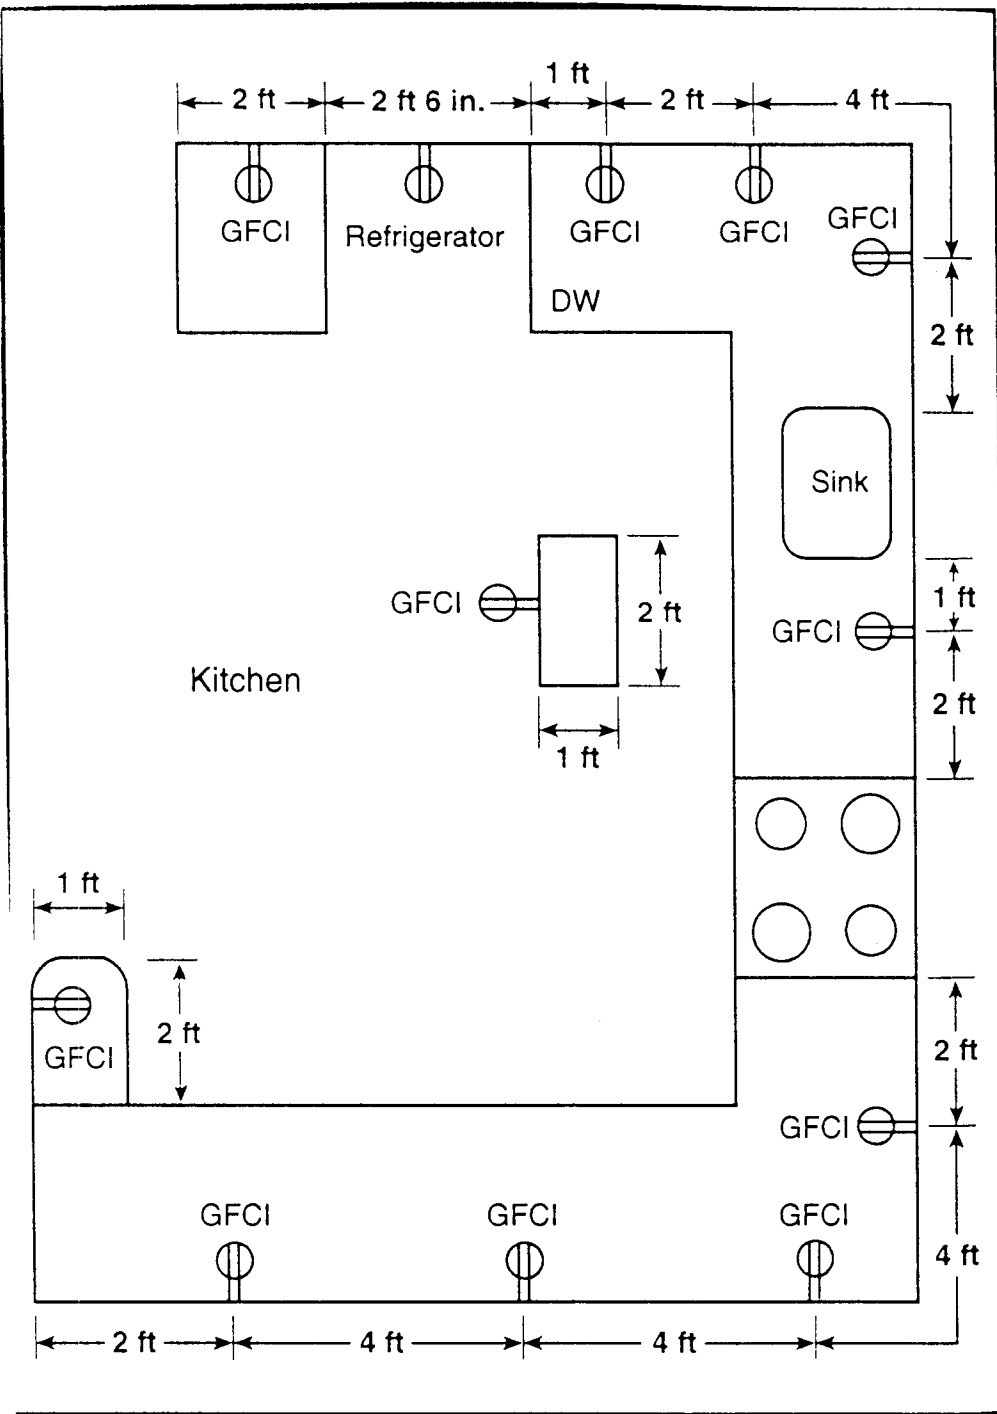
Dwelling unit receptacles serving countertop spaces in a kitchen and installed in accordance with Section 210-52(c).
